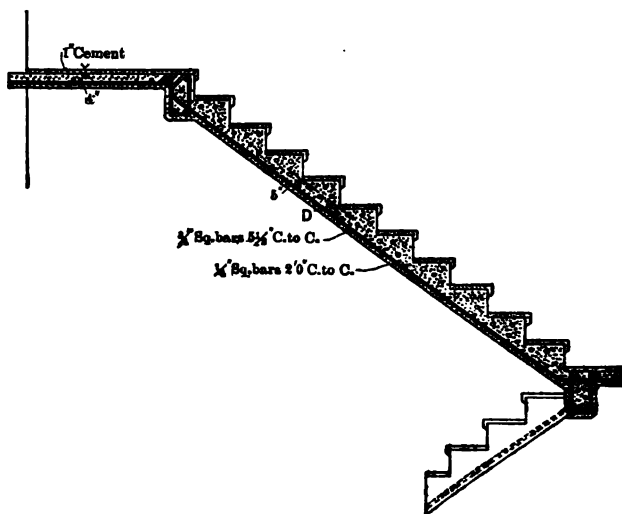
Section through Flight of Reinforced-concrete Stairs
